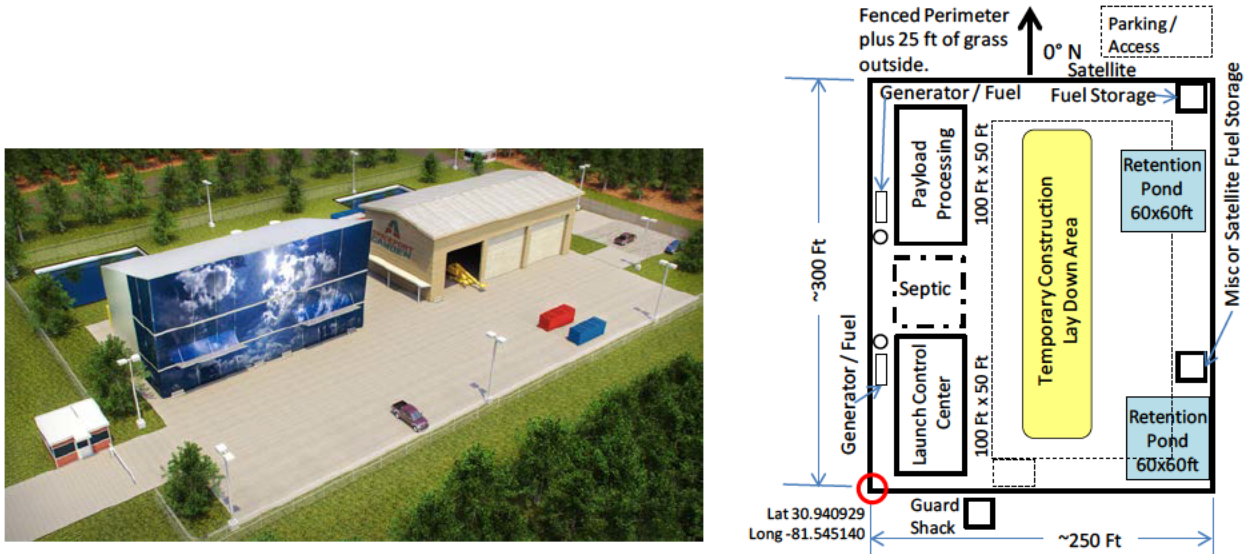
Launch Control Center Complex (Artist Rendering and Schematic Layout)
